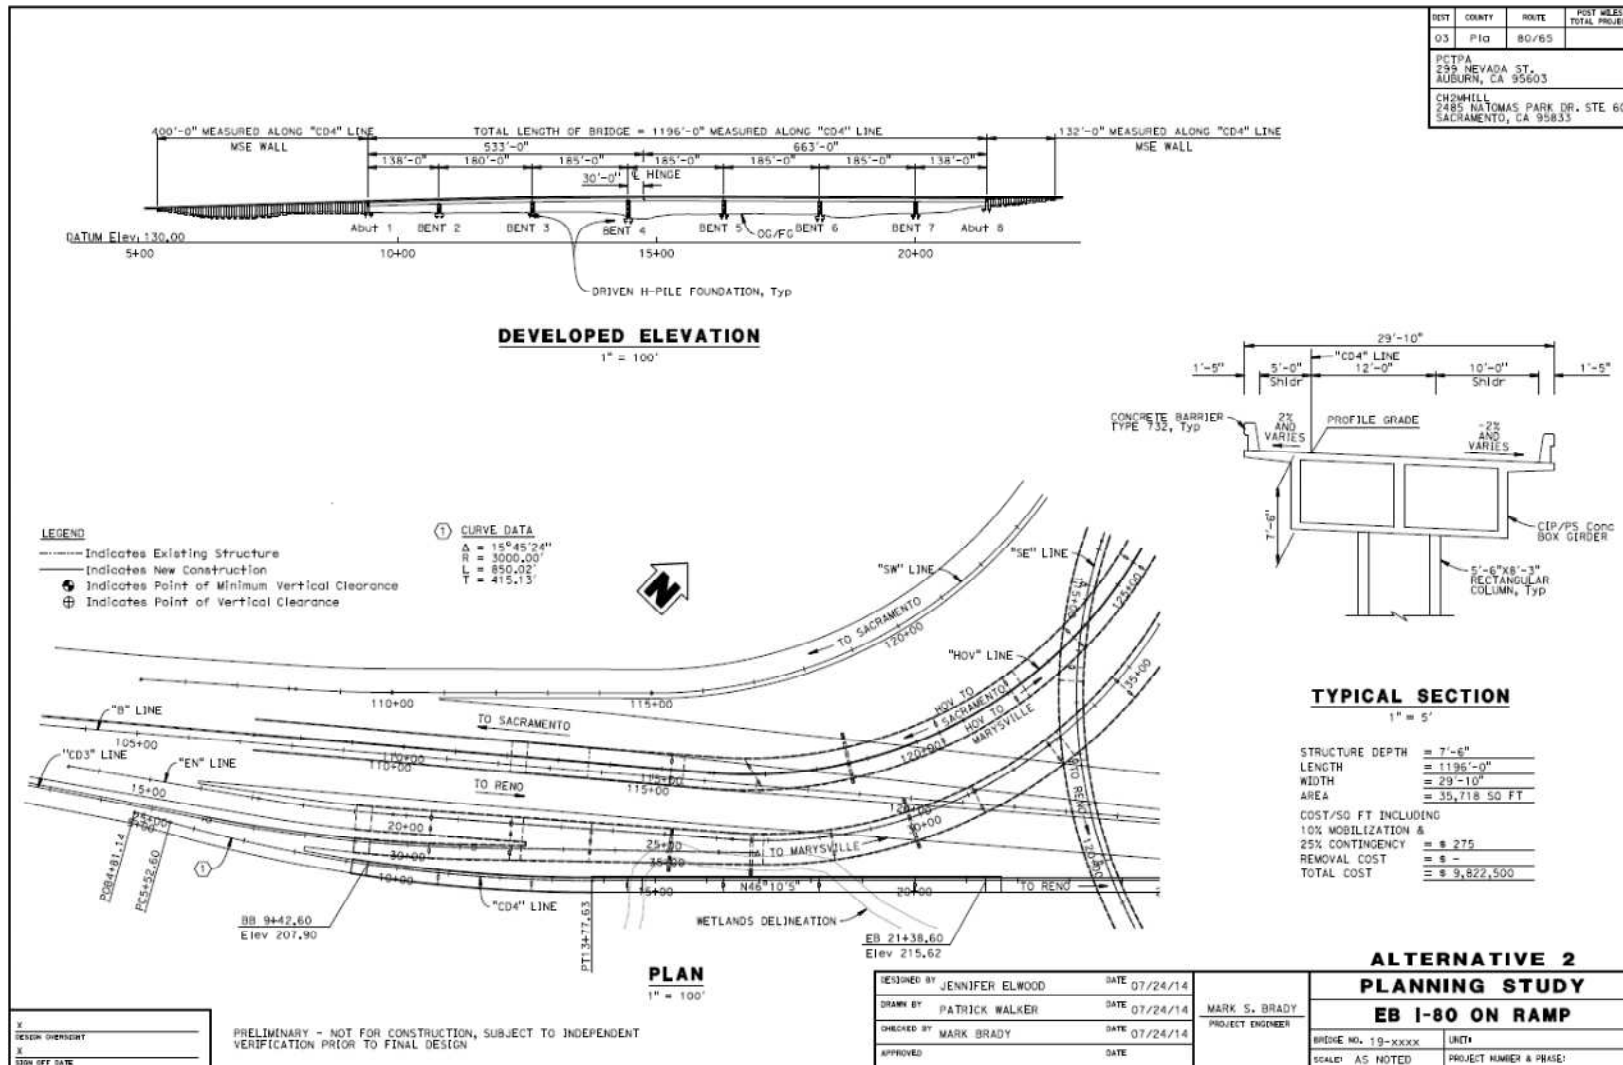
Proposed EB On-Ramp Plan (Alternative 2)
